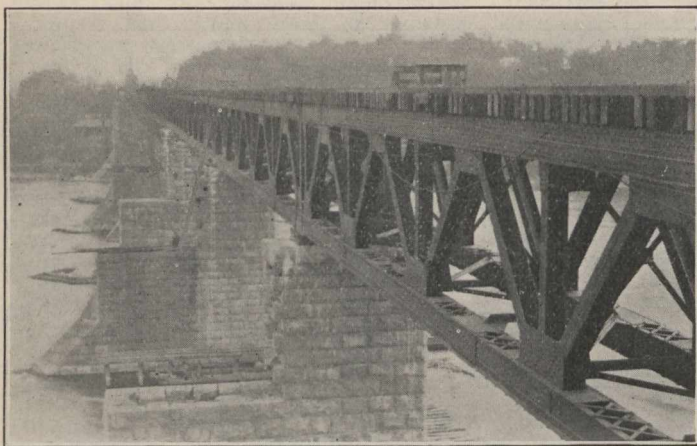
New Spans and Uncompleted Piers, looking towards Lachine Side.
